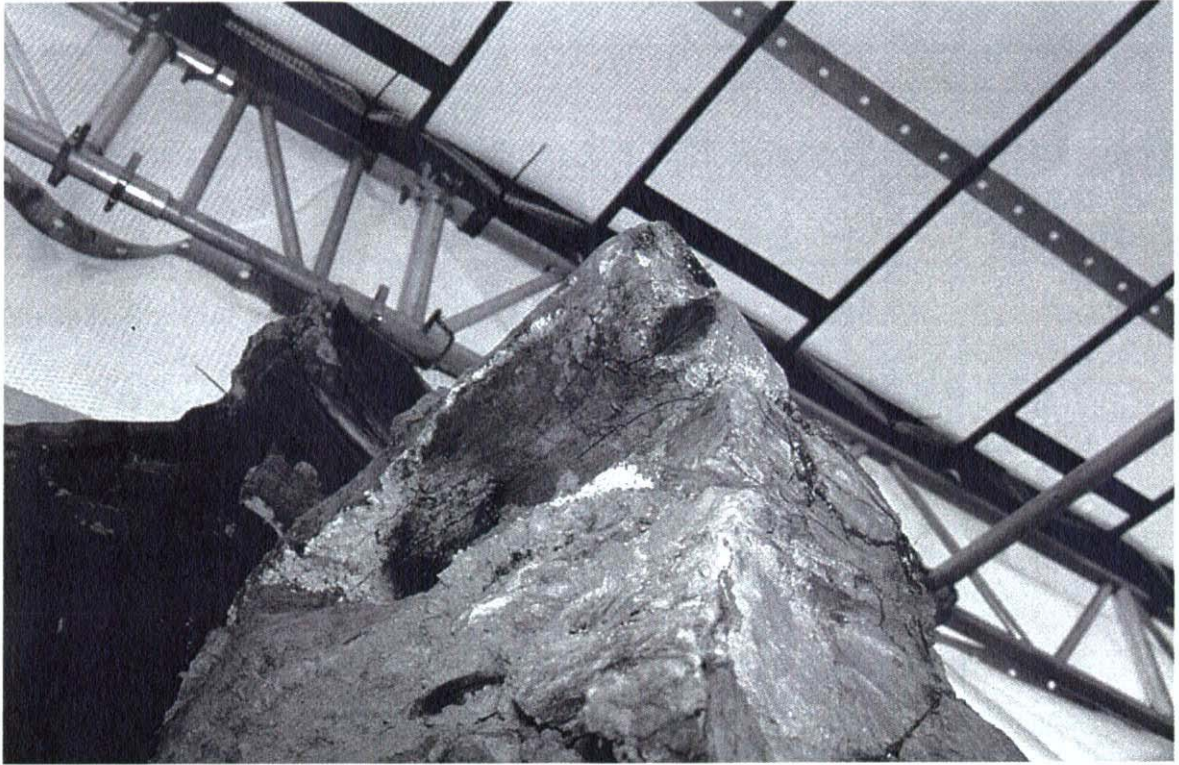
Detail of W gable (purlin remnant possibly from 16th century roof structure).
